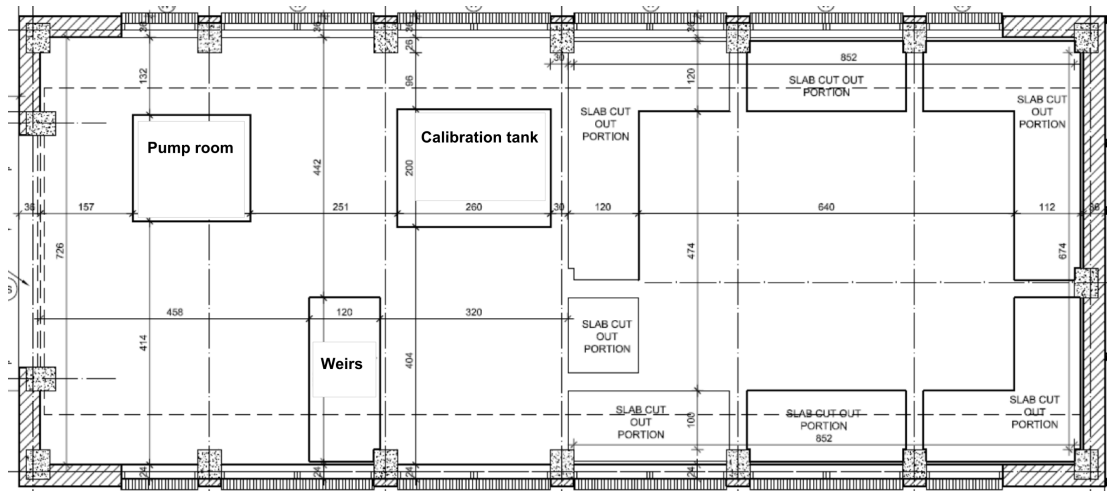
Technical drawing of the laboratory floor at TTL [9].
